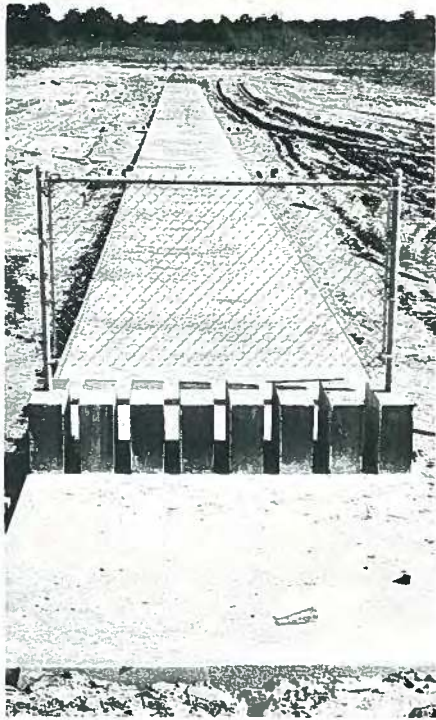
First prestressing bed built by Florida Prestressed Concrete Co., Inc., in 1953, in Tampa (Courtesy: Paul Zia).
